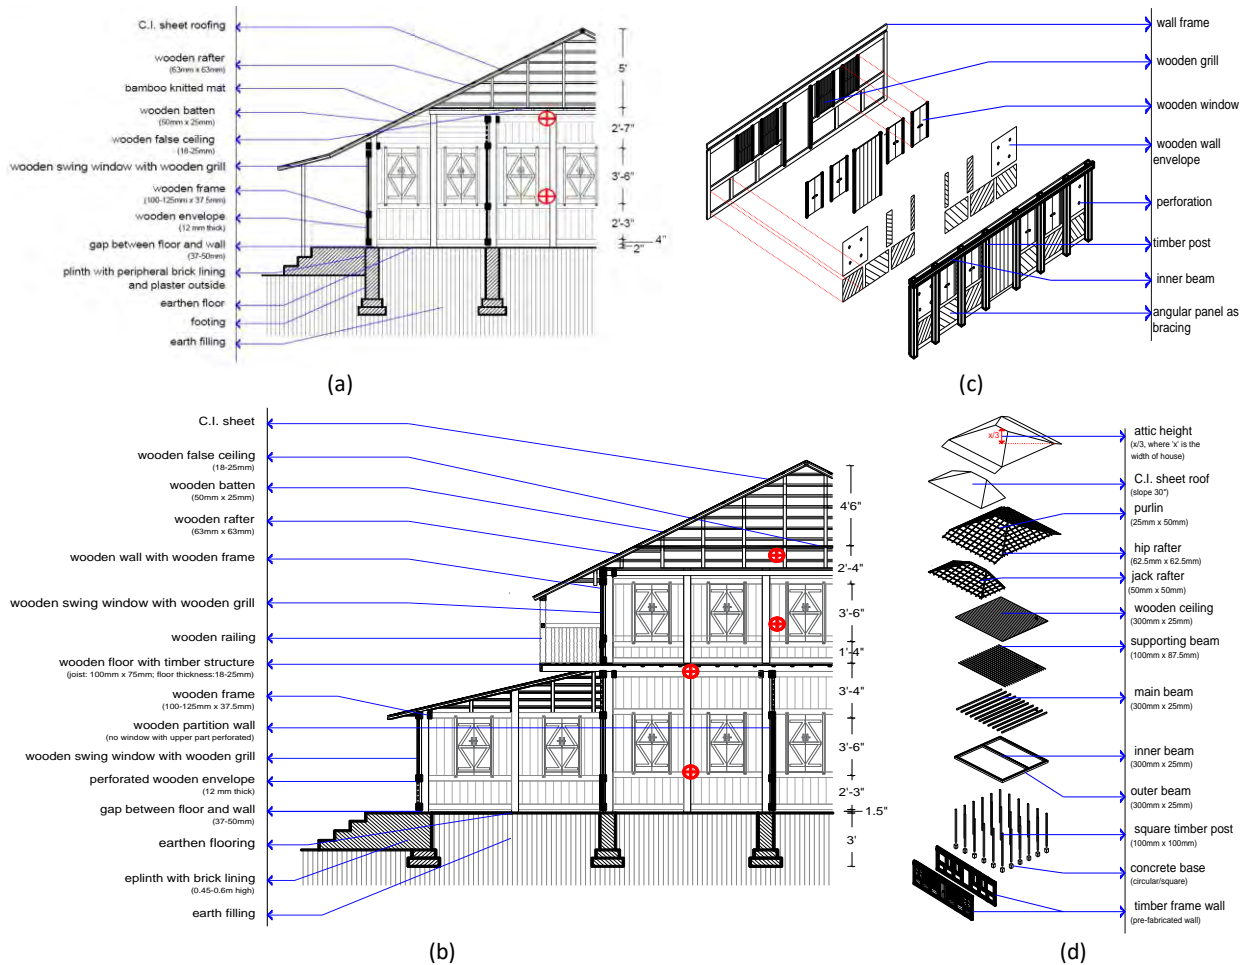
typical section and envelope details: (a) single-storied house; (b) double-storied house; (c) prefabricated wall envelope and (d) exploded view of house components
